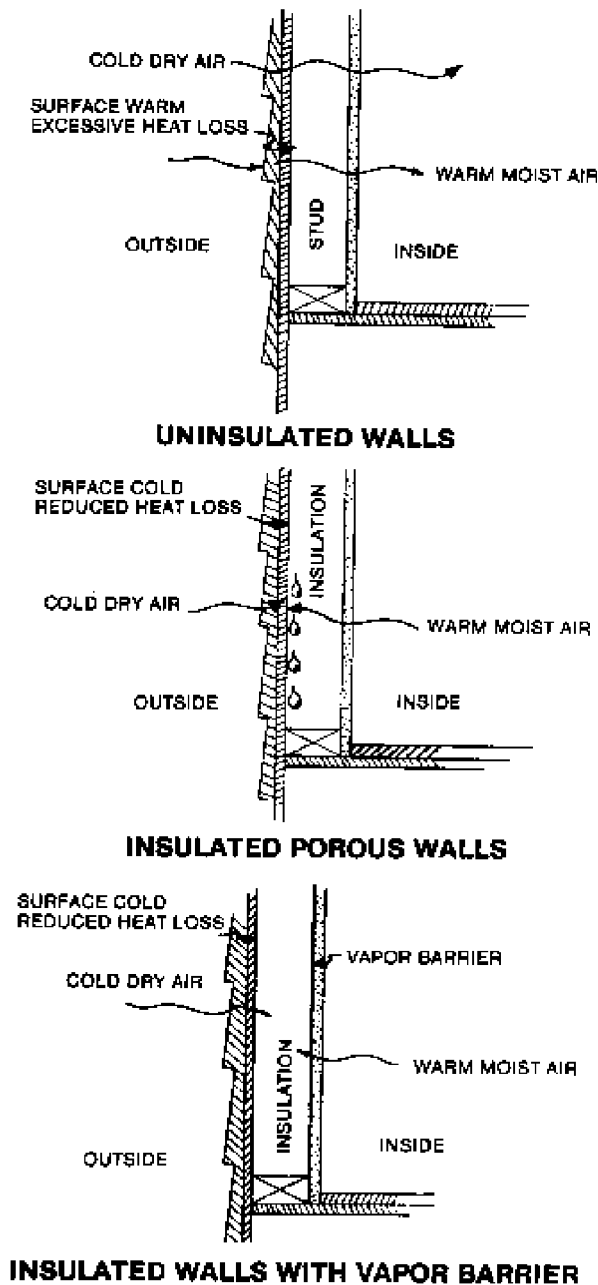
MOISTURE CONTROL IN EXTERIOR WALLS.
